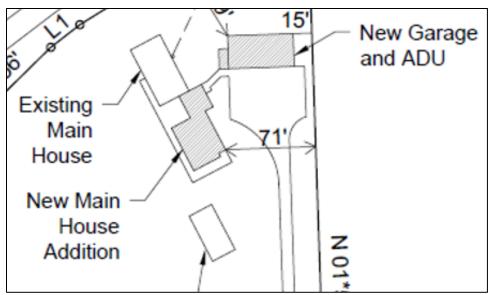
Detail of site plan with the principal residence and accessory structure with the Family Care ADU indicated.
